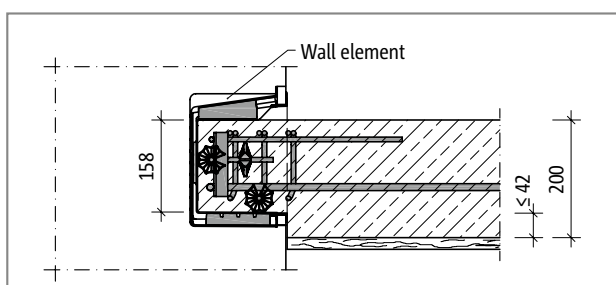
Schöck Tronsole® type Z: Wall element as stay-in-place formwork; underside of the landing lower than the connection frame of the wall element
